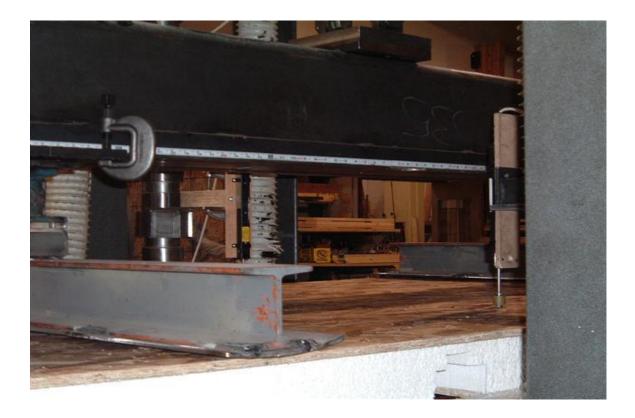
SIP IN AXIAL LOAD (COMPRESSION) TEST APPARATUS – LOAD HEAD END
